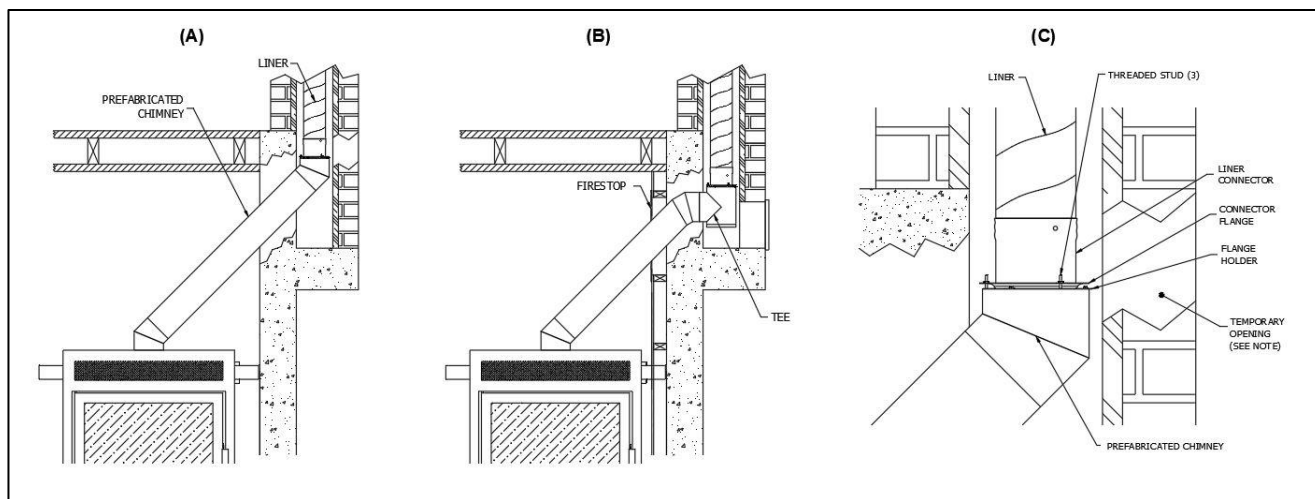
(A) Connection into a masonry chimney through an elbow/liner; (B) connection into a masonry chimney through a tee/liner; (C) detailed drawing of masonry chimney connection.
